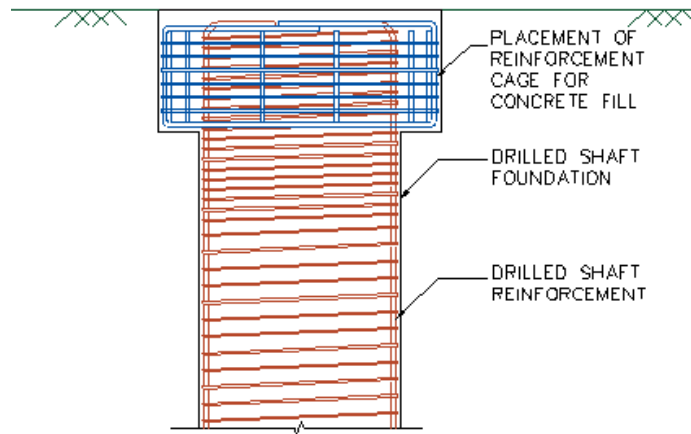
Positioning of Reinforcement Cage and Concrete Casting
